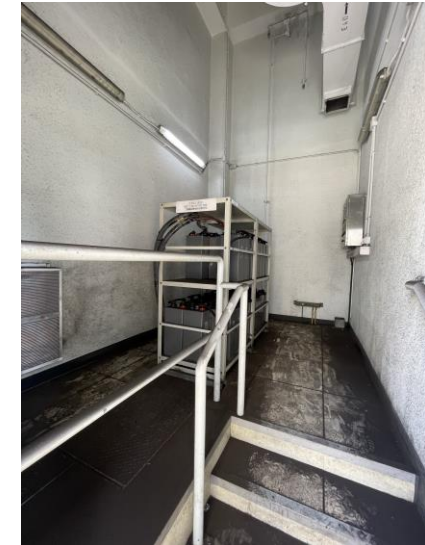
Battery room in Unit 2 FGD Electrical and Control Equipment Building
